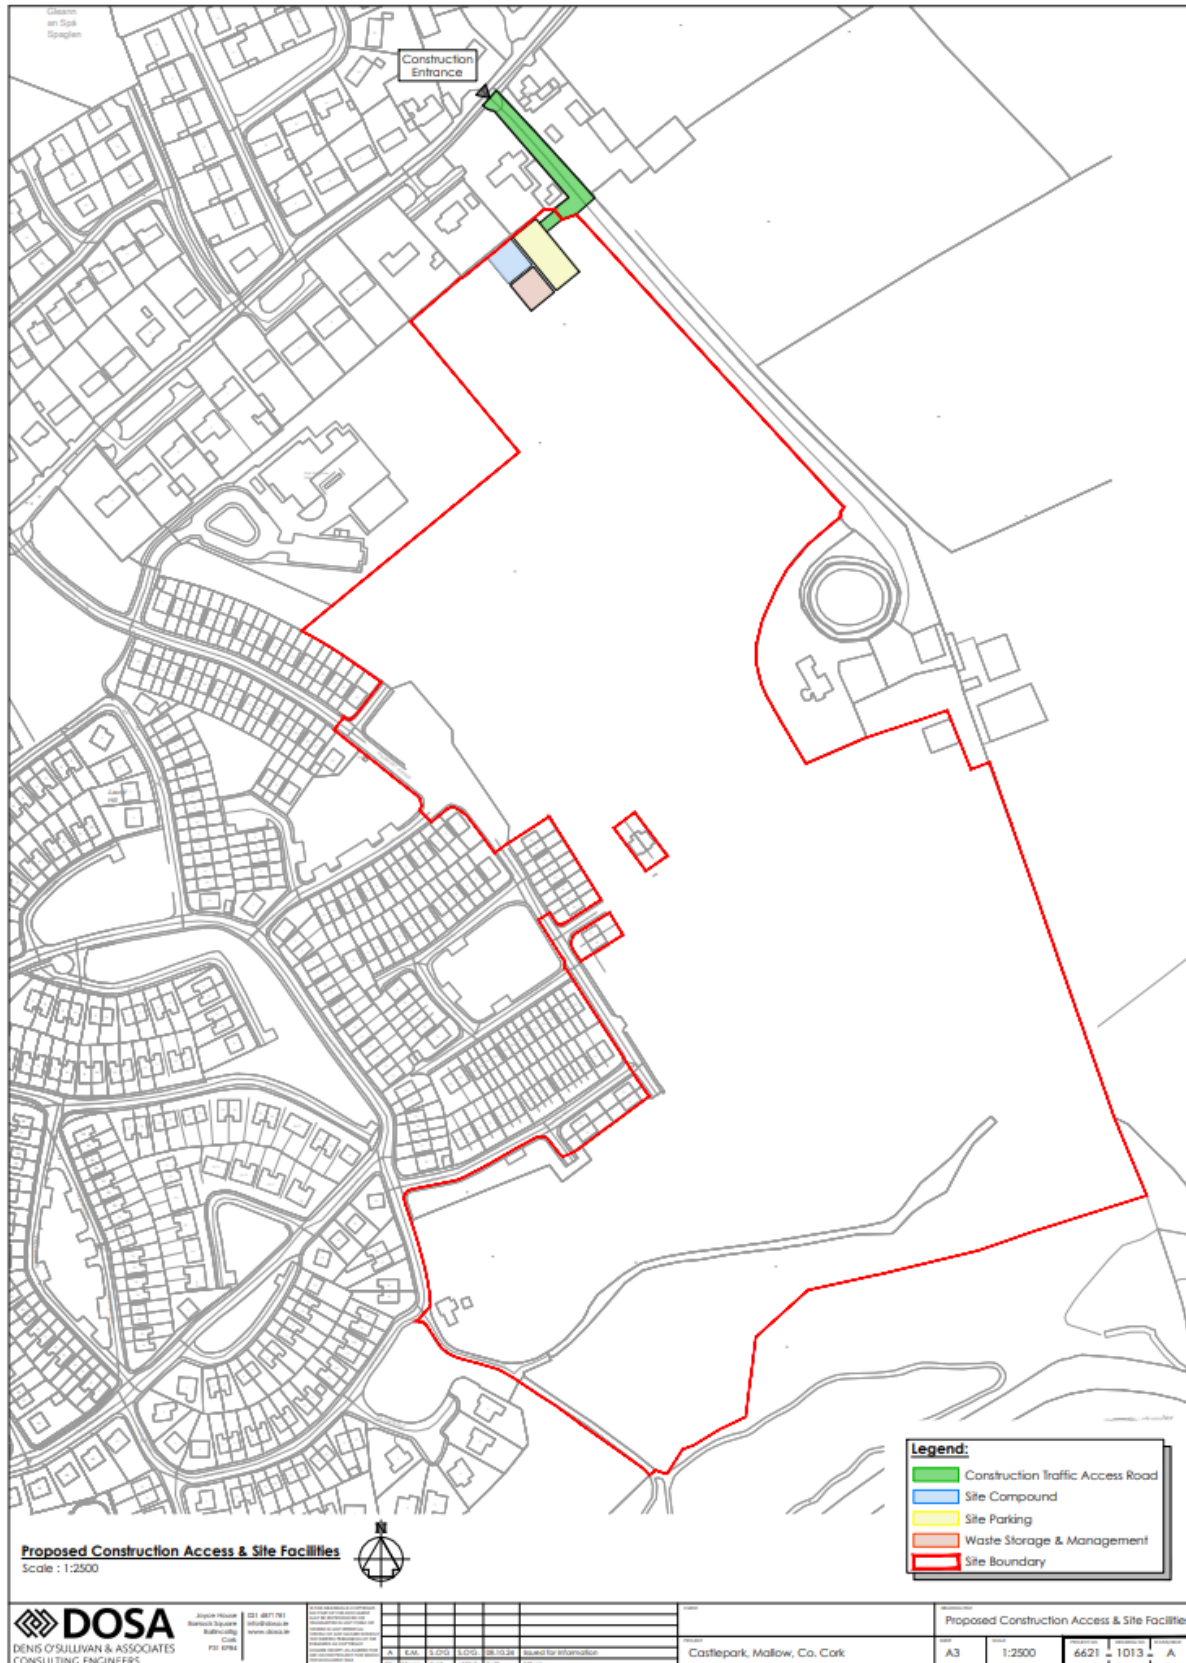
Site Facilities, Access, Waste Storage Area, and Parking
